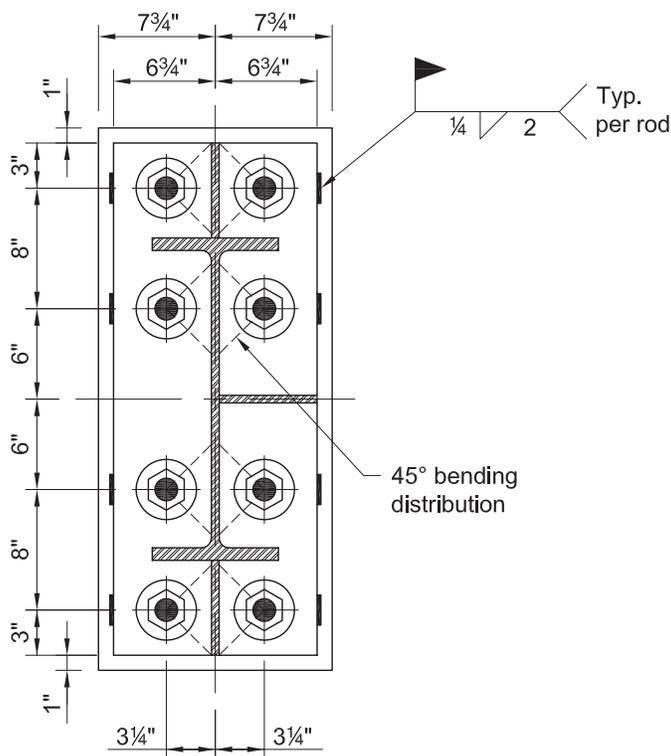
Base connection plan view as detailed in Example 4.7-7.
